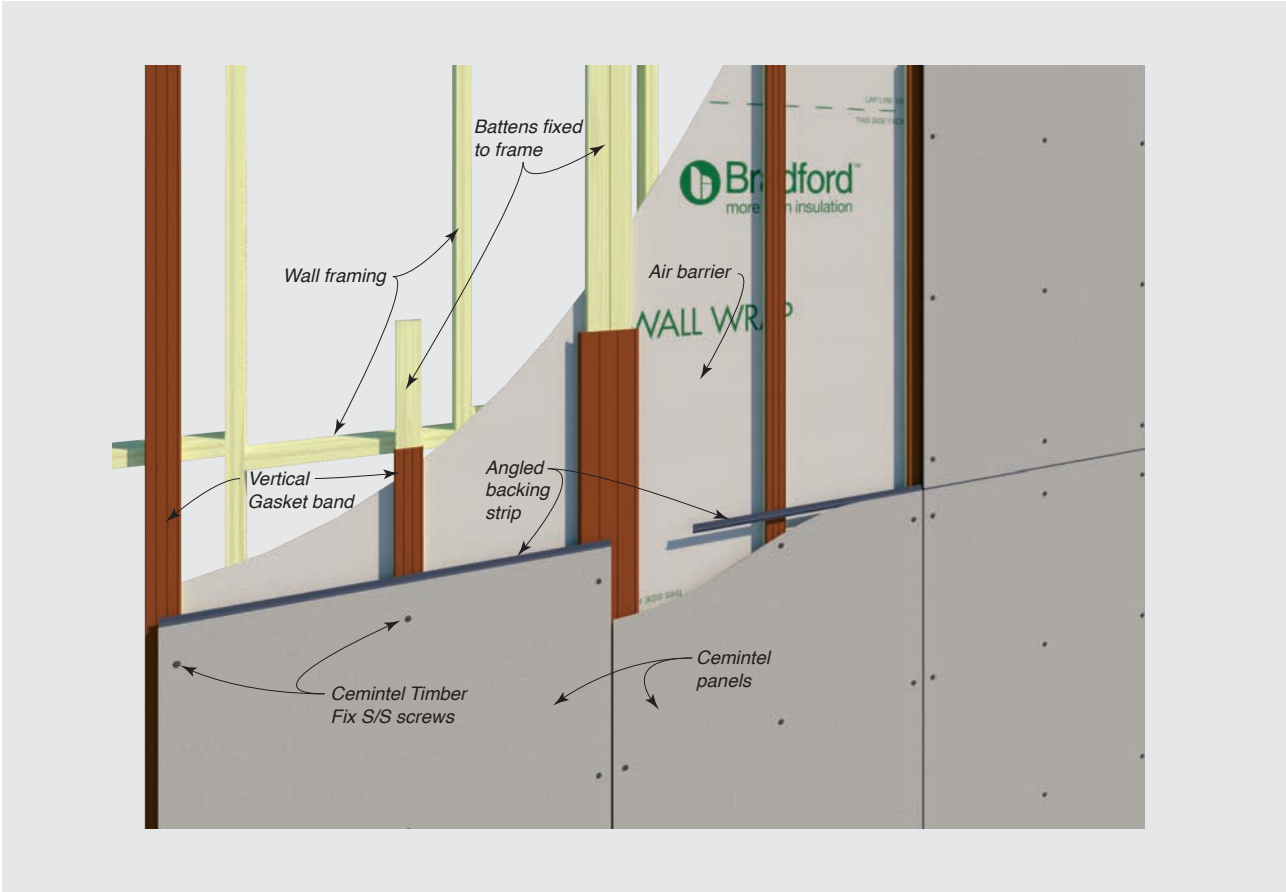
Barestone External and Surround on Timber Battens Overview
